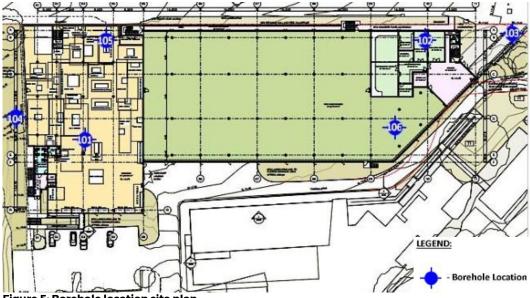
Borehole location site plan Source: Alliance Geotechnical
